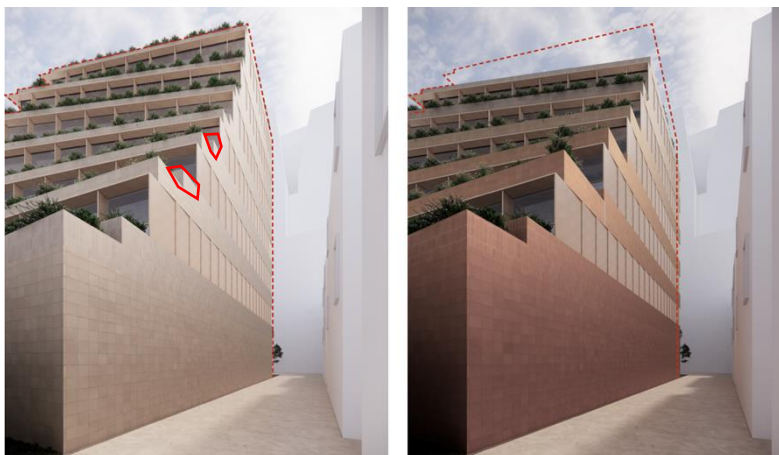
Artist's impression of original proposal (left) and revised proposal (right) showing reduction in parapet heights at each level
